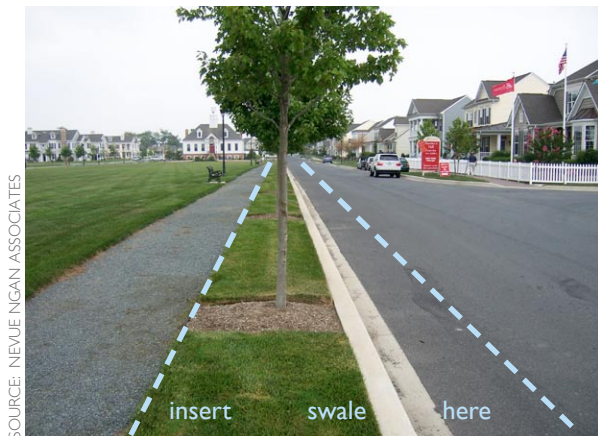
A potential residential street swale opportunity in an existing planting strip. Dashed lines show where a vegetated swale could be added.
